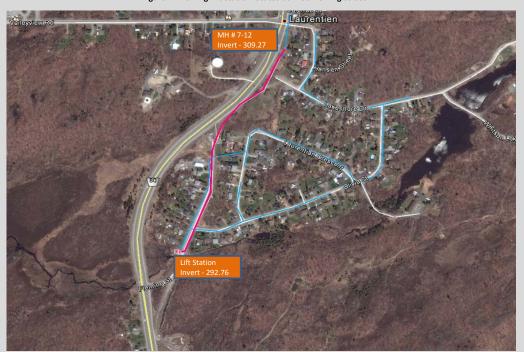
Manhole location and invert elevations surrounding Fleming Pumping Station
